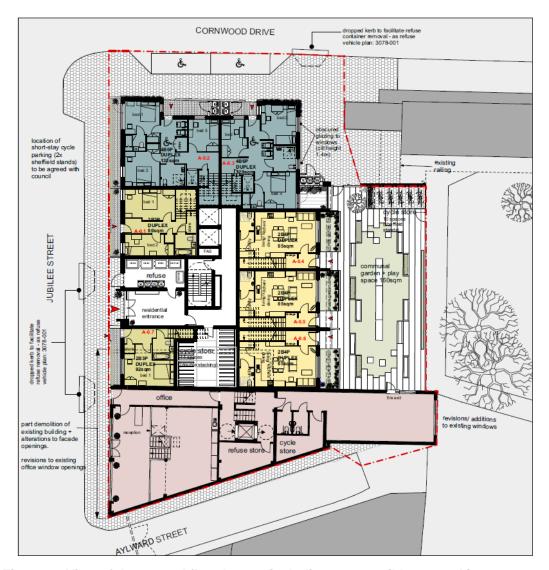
View of the ground floor layout, including 2 accessible car parking spaces on Cornwood Drive.
